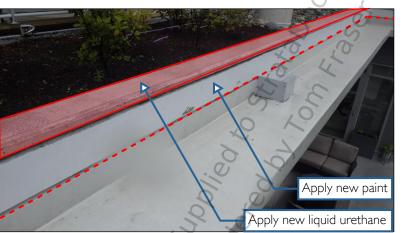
Recommended parapet repairs along the green roof/podium above the garden suites.
